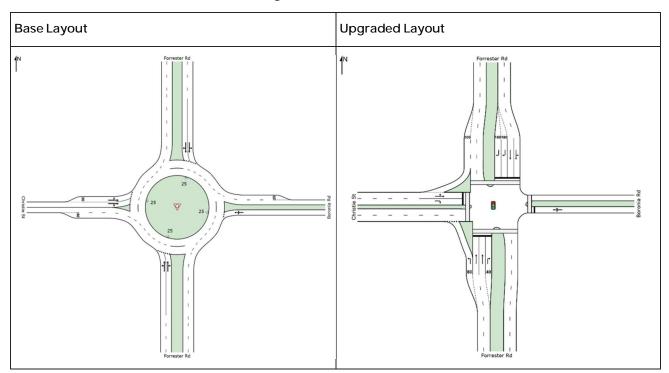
2026 with Links Road extension - Forrester Road/Christies Street/Boronia Road
